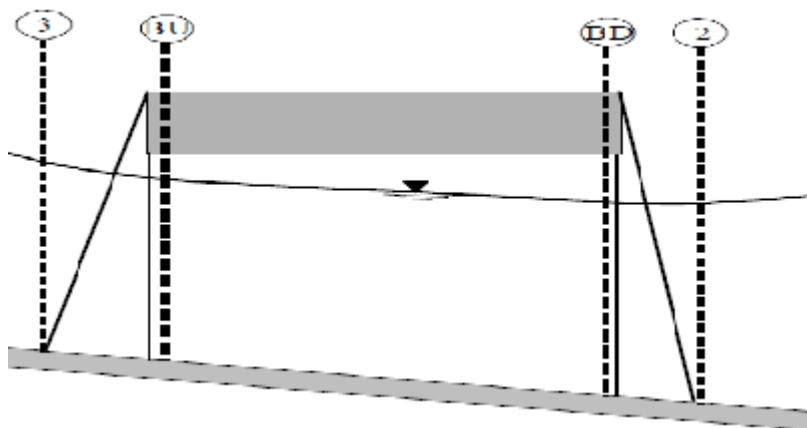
Scheme of near and inside of bridge cross section (source: Gary W 2010)
